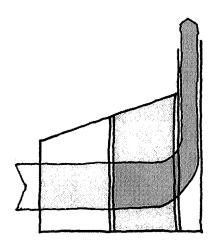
The chimney used as spatial element: zoned house in plan and section with tall chimney placed along the roof's ridge.
